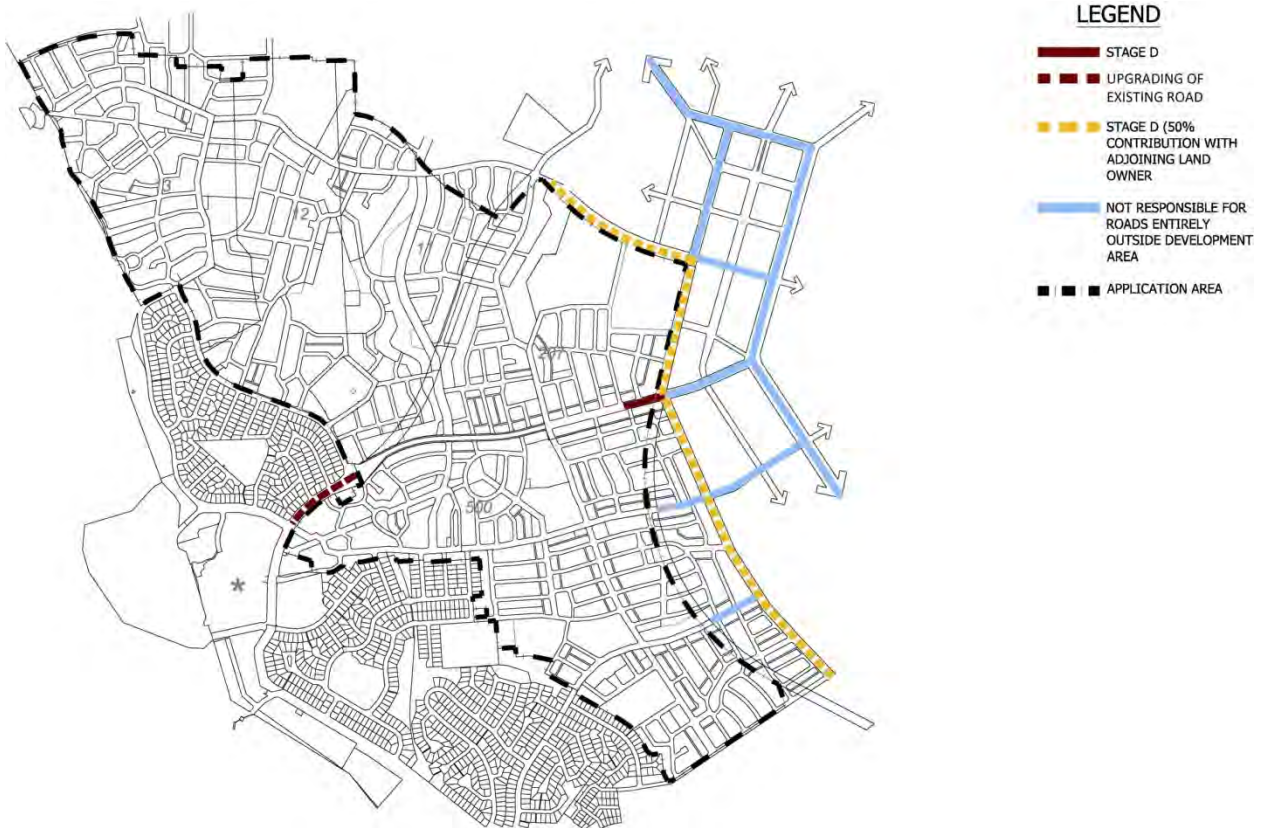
STAGE D MAJOR ROAD CONSTRUCTION [SOURCE: SKM]
